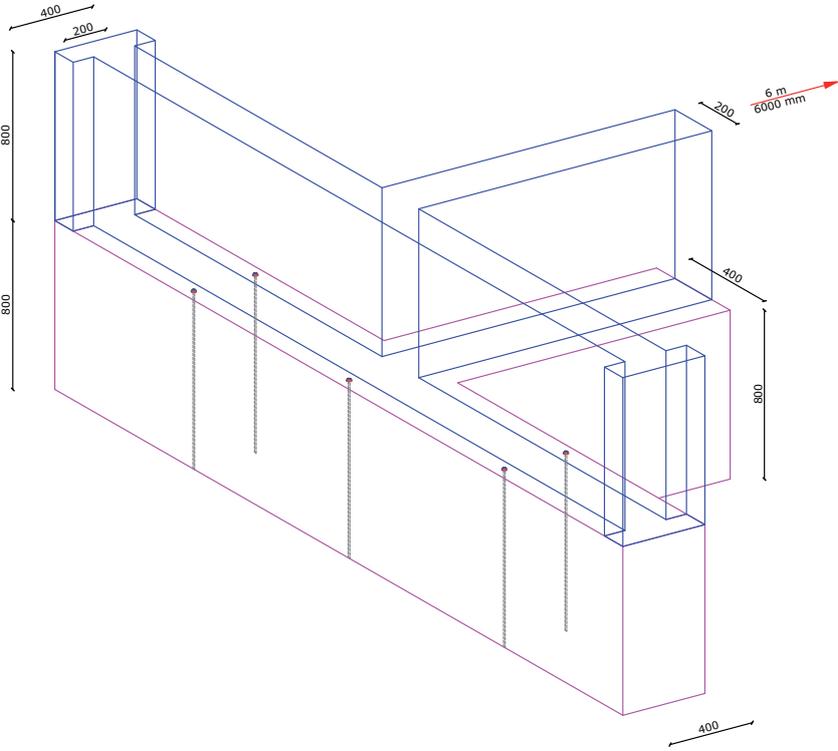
The upper part is the concrete panel wall, the lower part is the concrete base.
